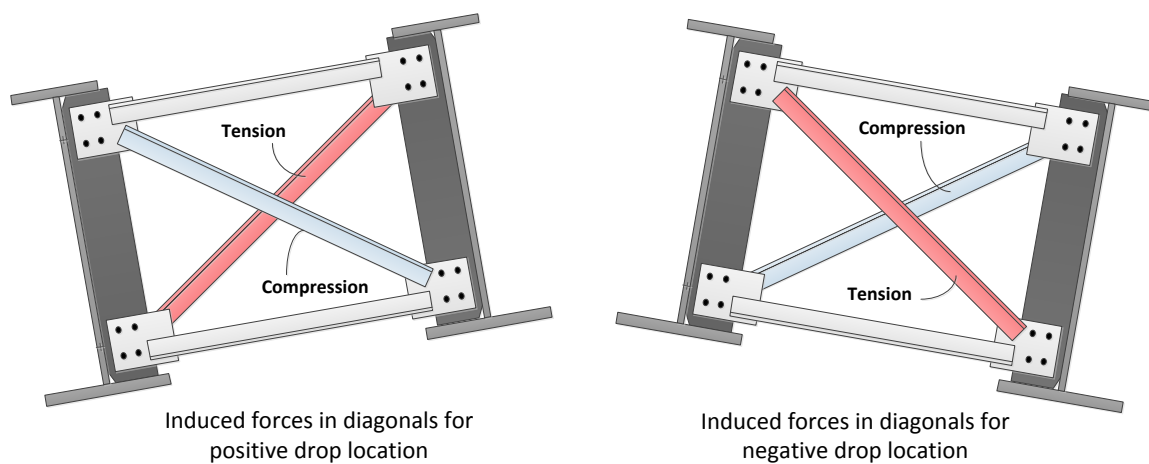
NISSS54, Cross-frame forces between Girder 1 and 2 under lack-of-fit due to TDLF detailing.
